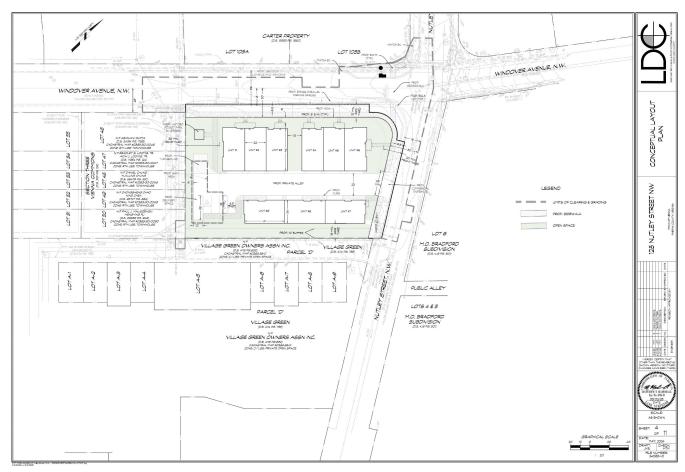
Conceptual Layout Plan - Alternate Design (Prepared by LDC)
